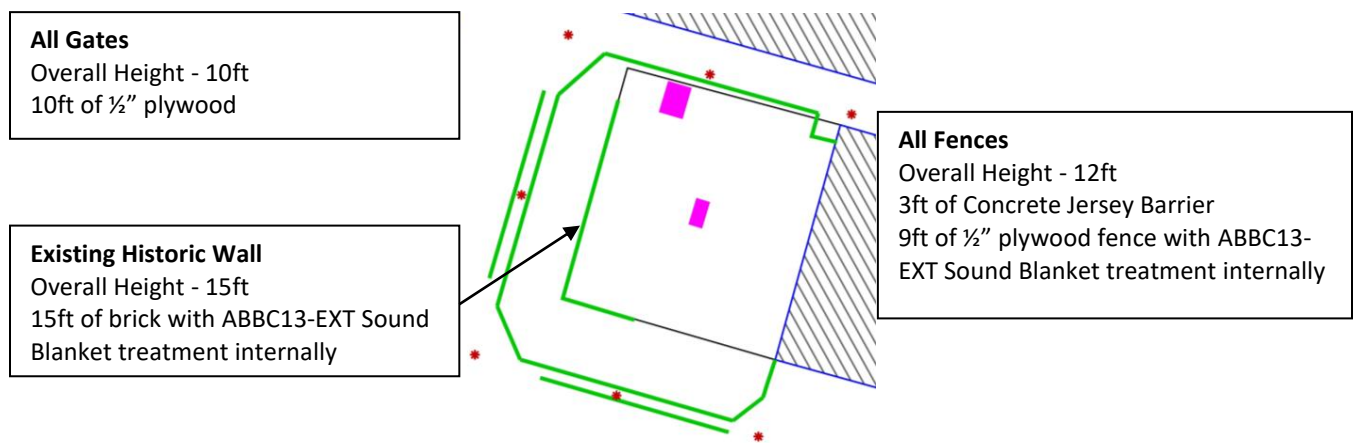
Details of Perimeter Fence Construction to Achieve Regulatory Requirements
